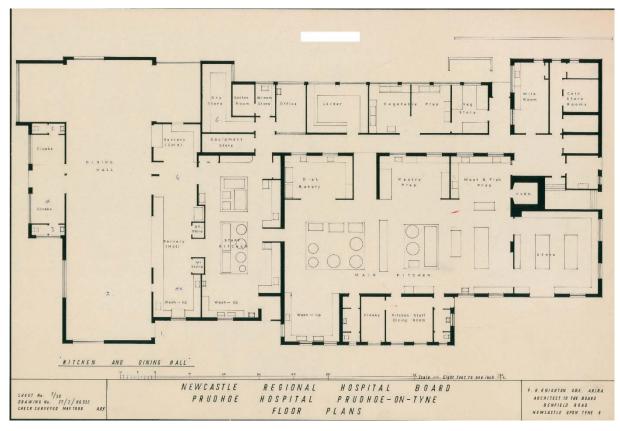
Building 34, Derwent Kitchen and Dining Hall, historic ground plan
